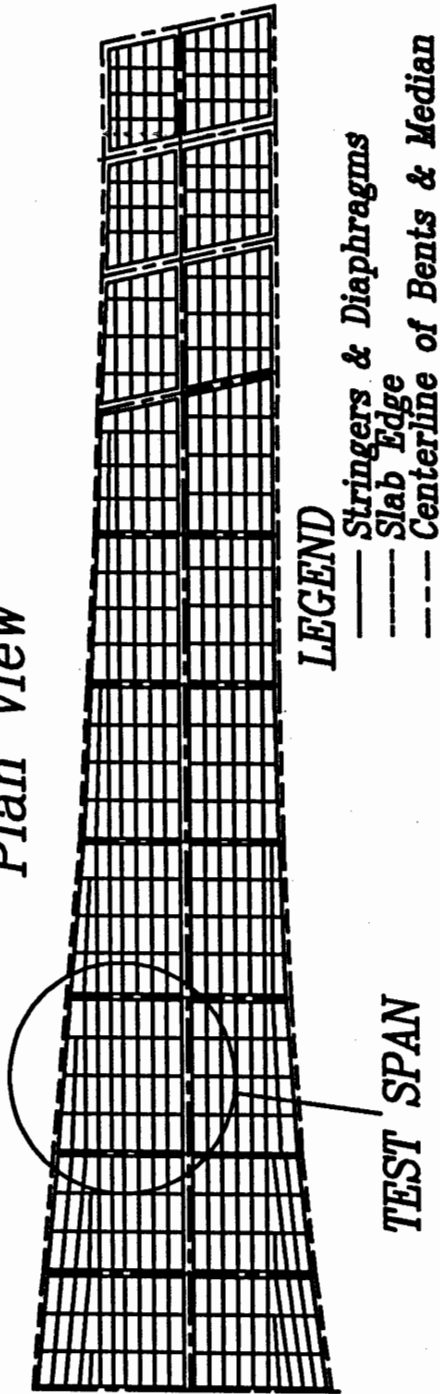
BRIDGE #101 PLAN VIEW SHOWING TEST SPAN
